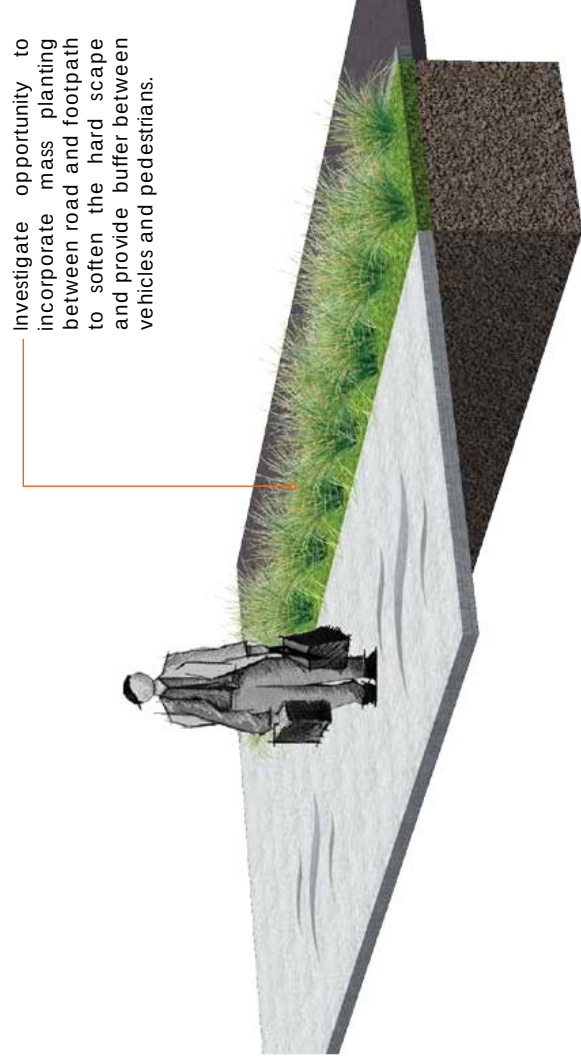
TYPICAL DETAIL - MASS PLANTING MAIN STREET
